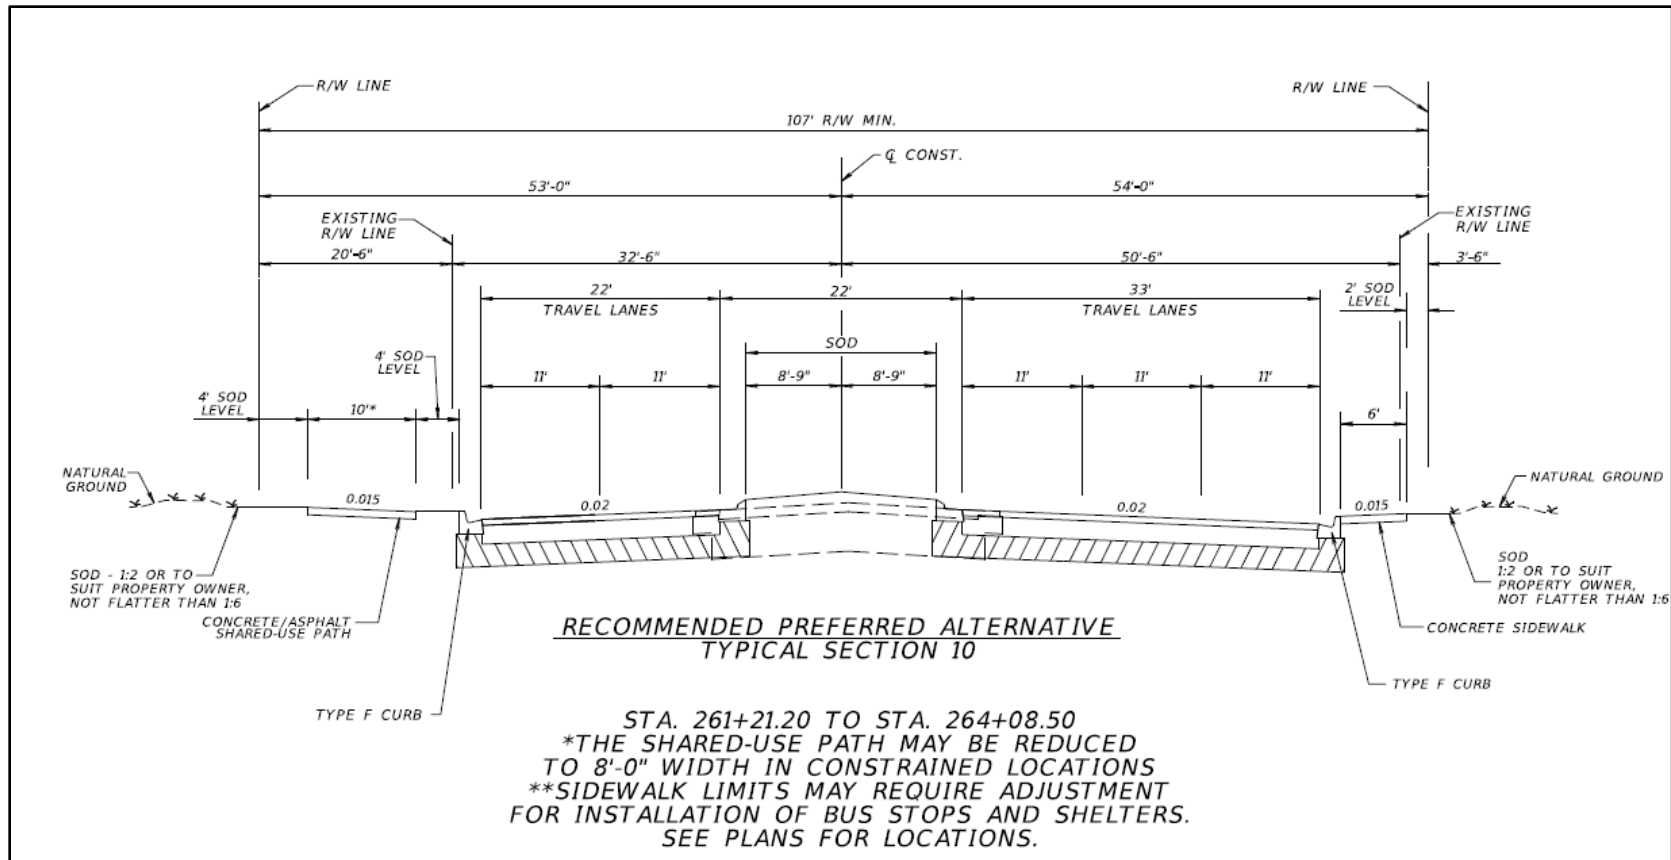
Representative Preferred Alternative Typical Section – West of Plaza Shopping Center
